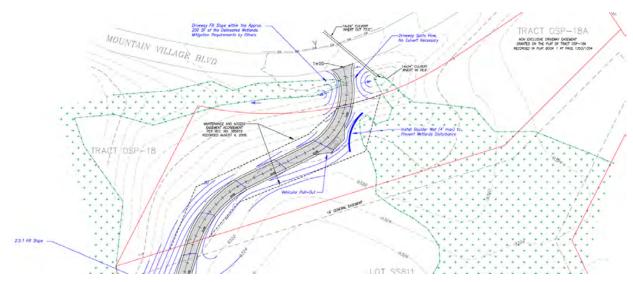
Site Grading and Drainage Plan, per application materials for Lot SS811
